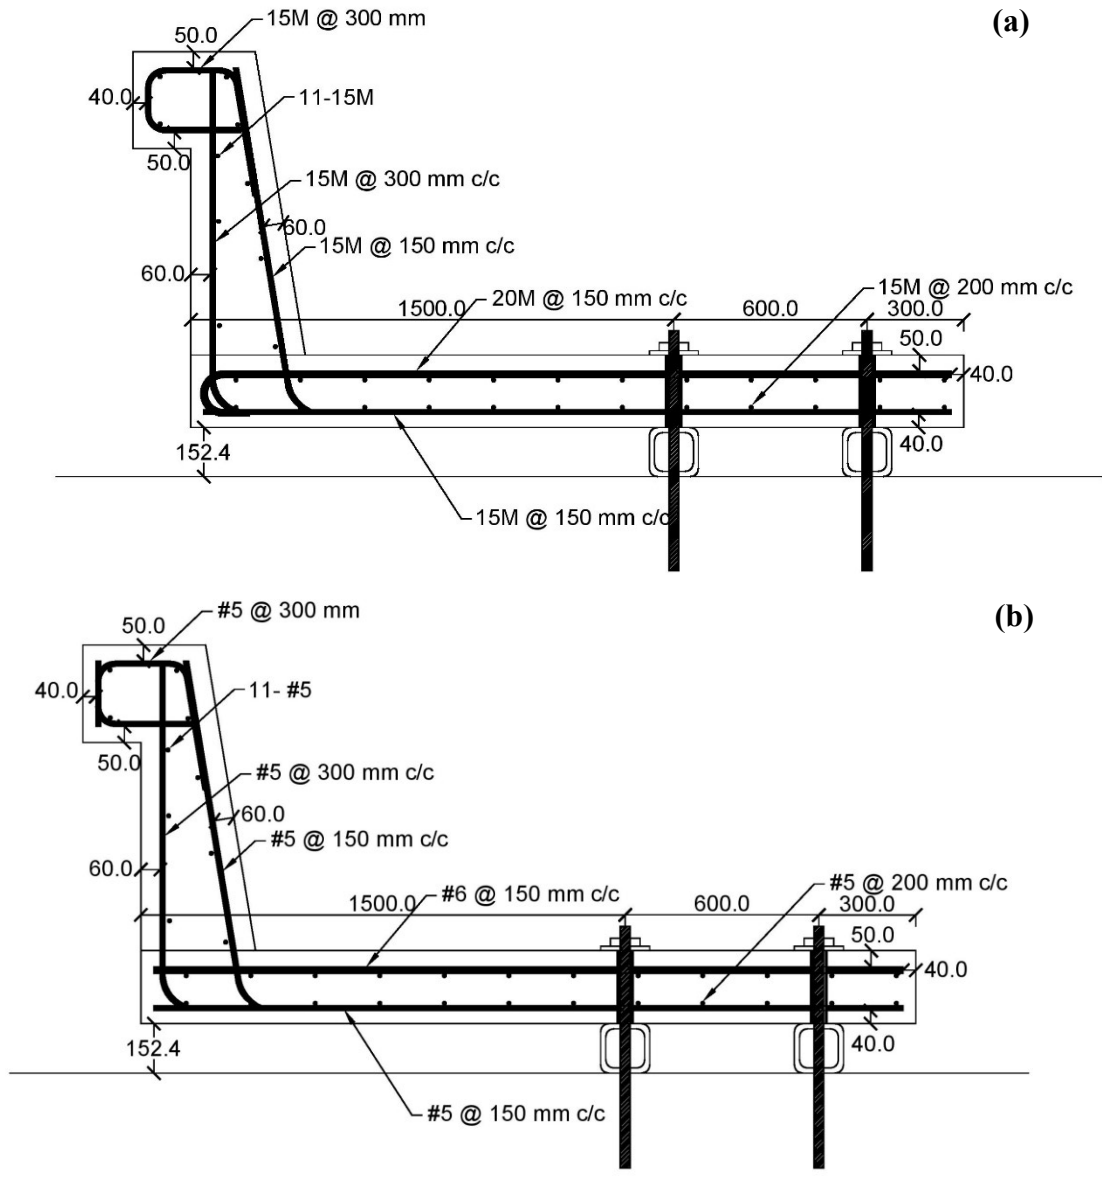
As-designed barrier test specimens (a) Specimen DS (b) Specimen DG.
